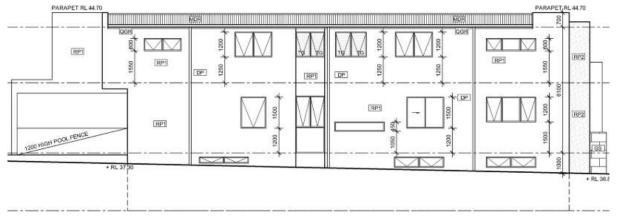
Western elevation of the proposed dwelling house (source: N Lycenko Architect, dated May 2020)
